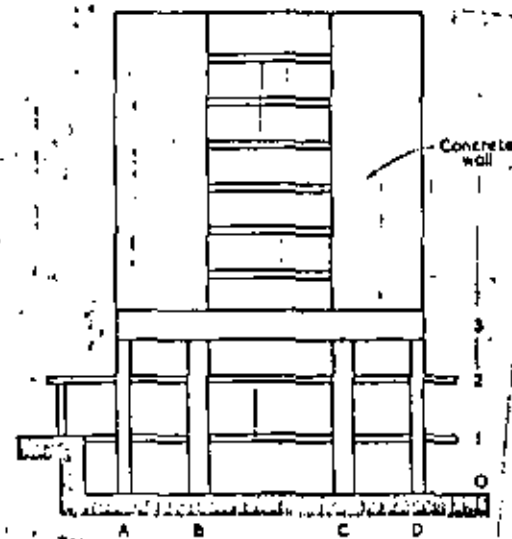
Schematic cross-section of building damaged during Caracas 1967 earthquake¹⁷
